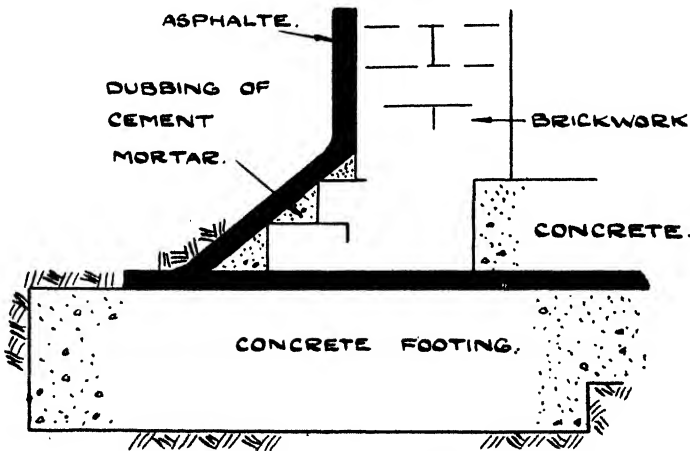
TREATMENT AT TOE OF WALL ON FOOTINGS
